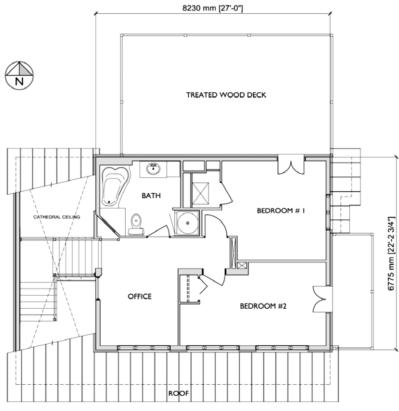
Second floor plan of ÉcoTerra (CMHC, 2007)
